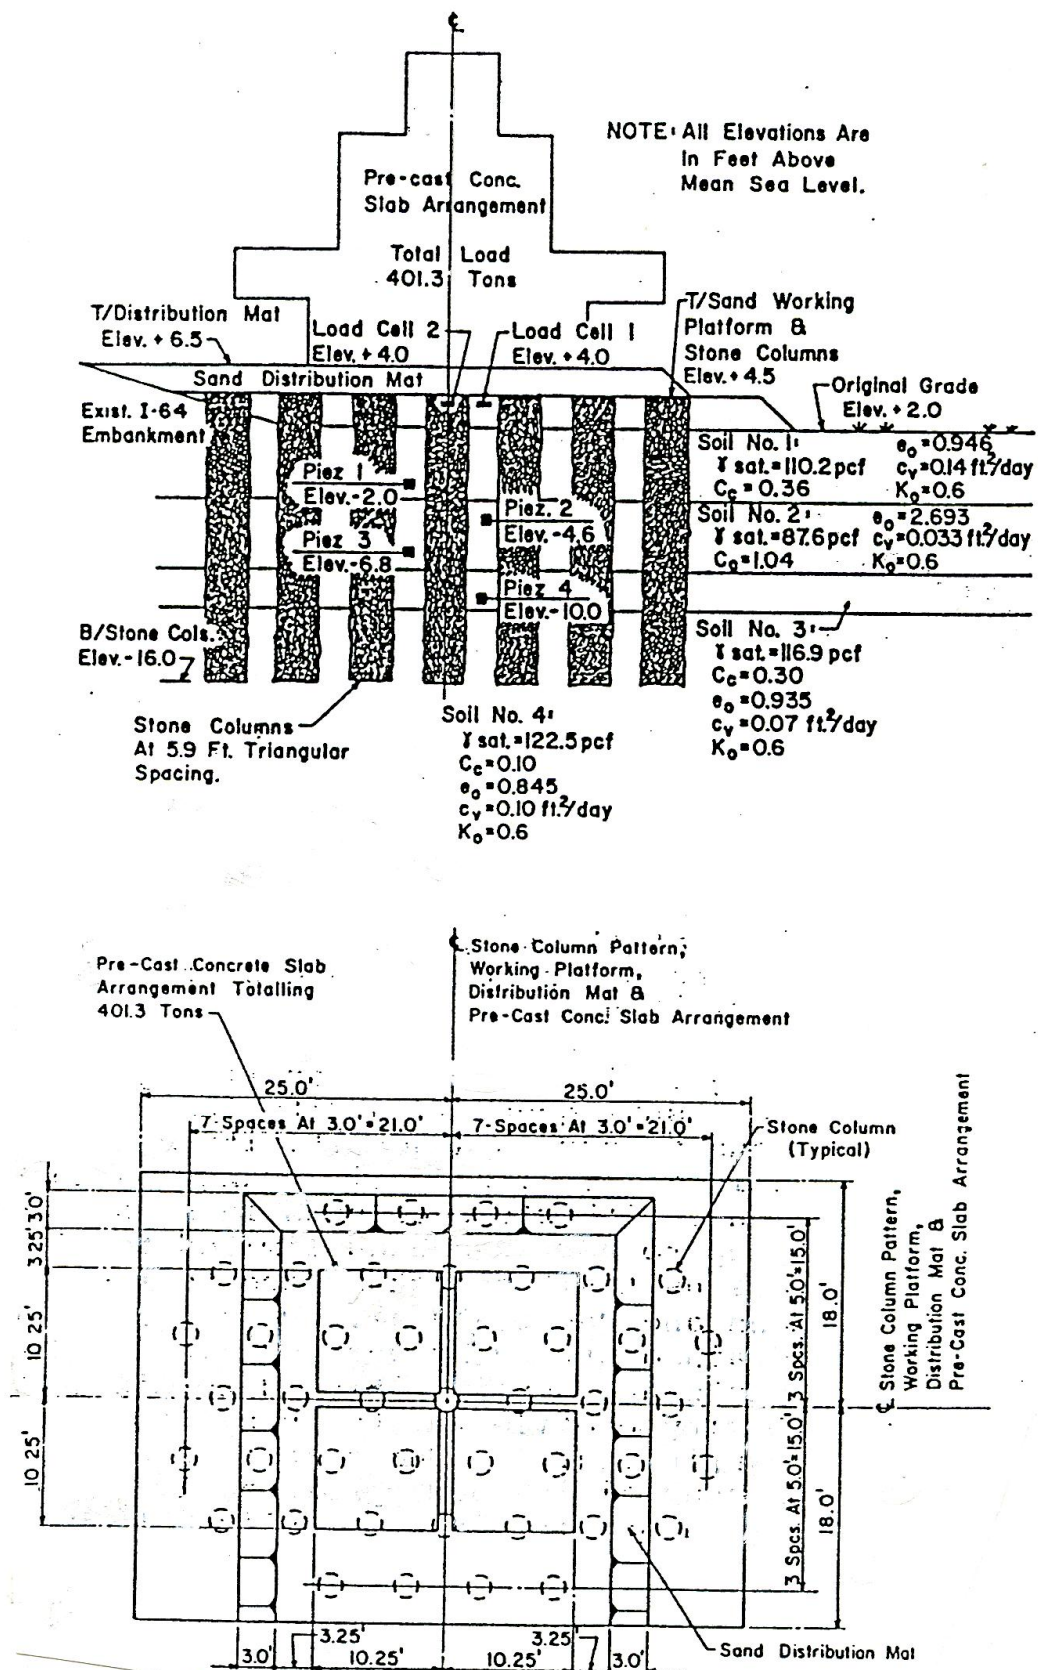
Field load test arrangement and stone column layout (after Goughnour and Bayuk, 1979a). 1 Inch = 25.4 mm; 1ft = 0.305 m.
